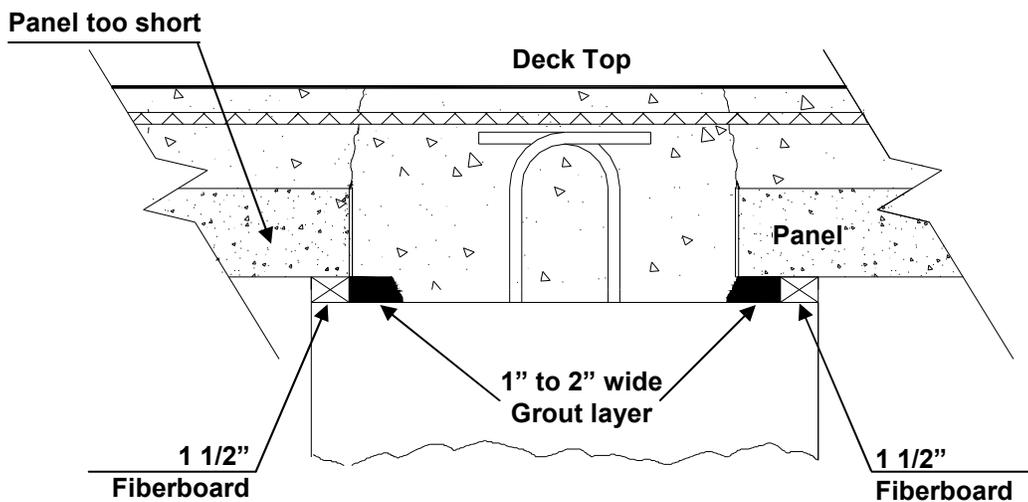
Bridge # 130085 Original Panel Bearing Detail
